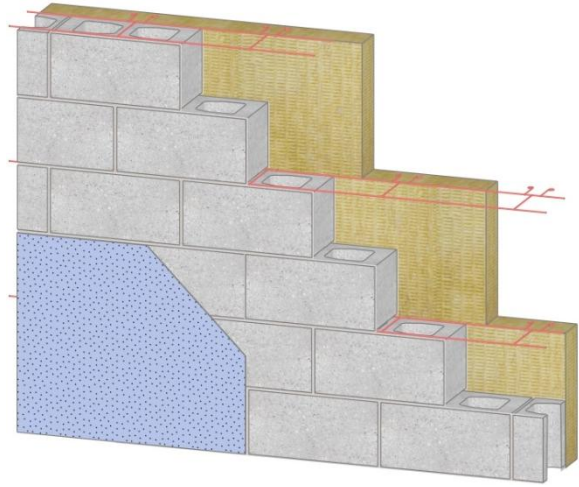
Projected Brick Ties with Bent Wire on CMU Wall
